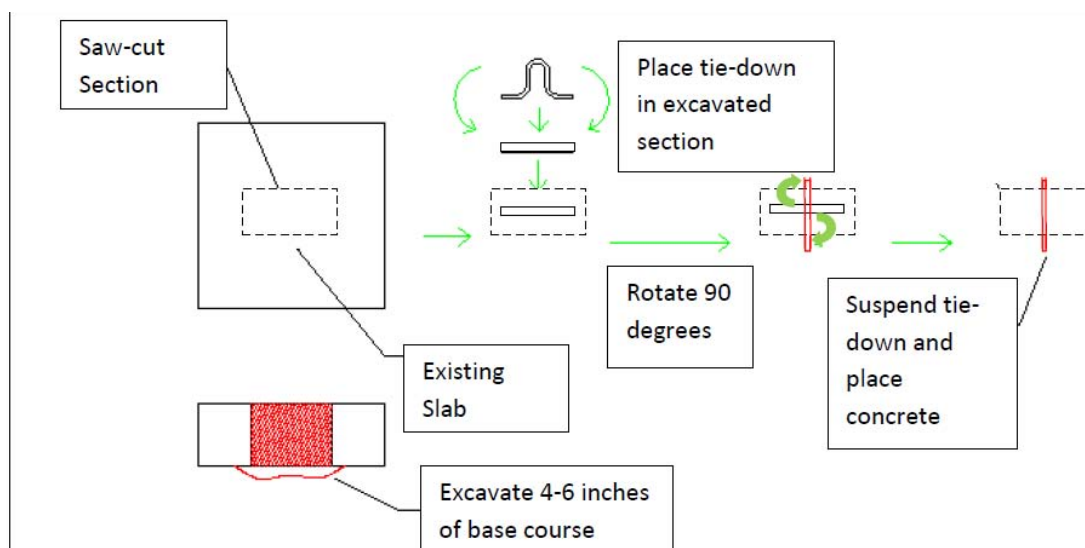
Hat-Type Anchor Installation Schematic: Saw-cut Method
